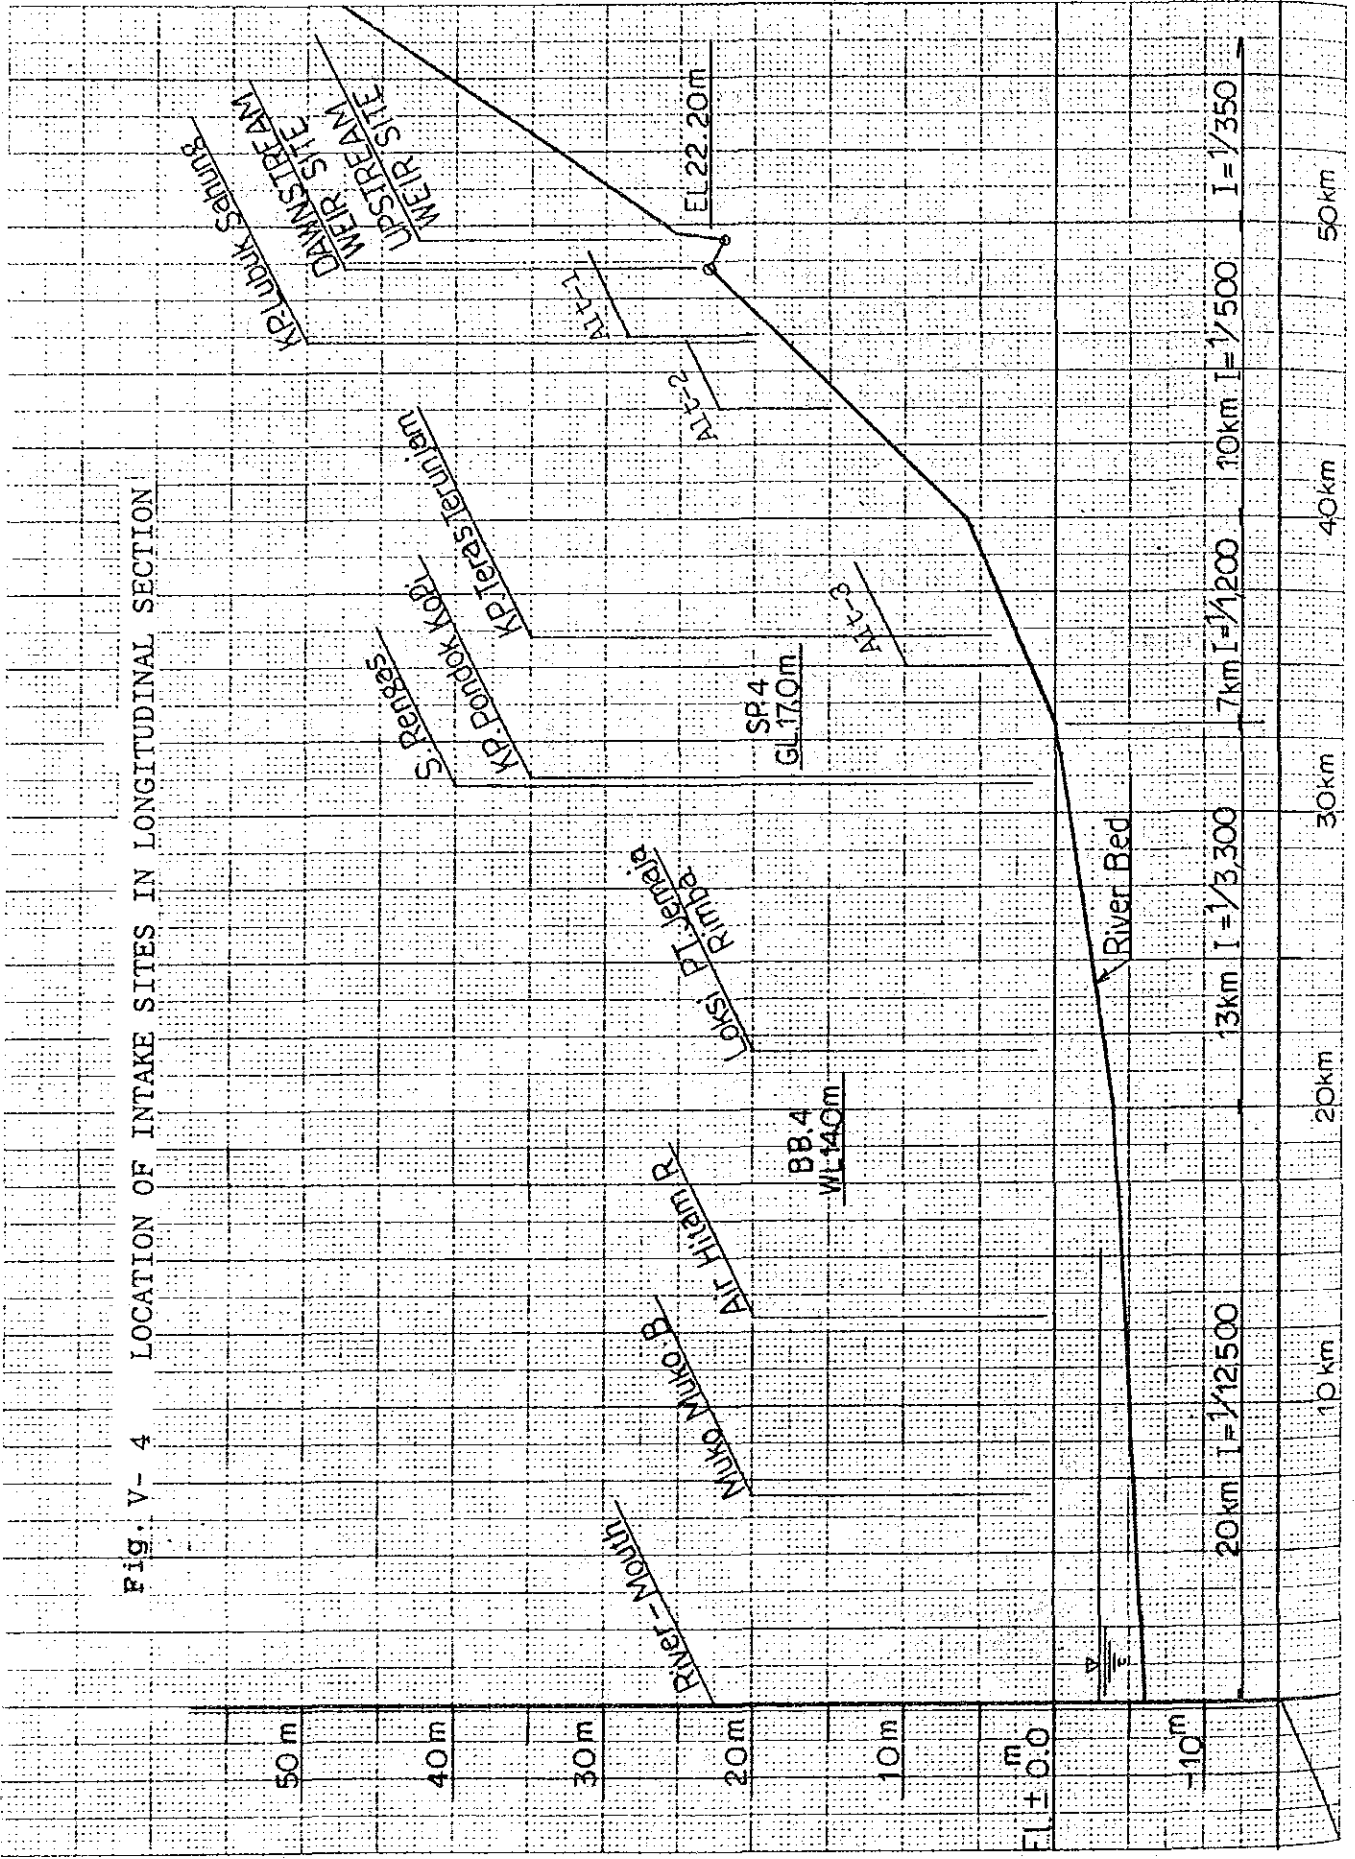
LOCATION OF INTAKE SITES IN LONGITUDINAL SECTION
